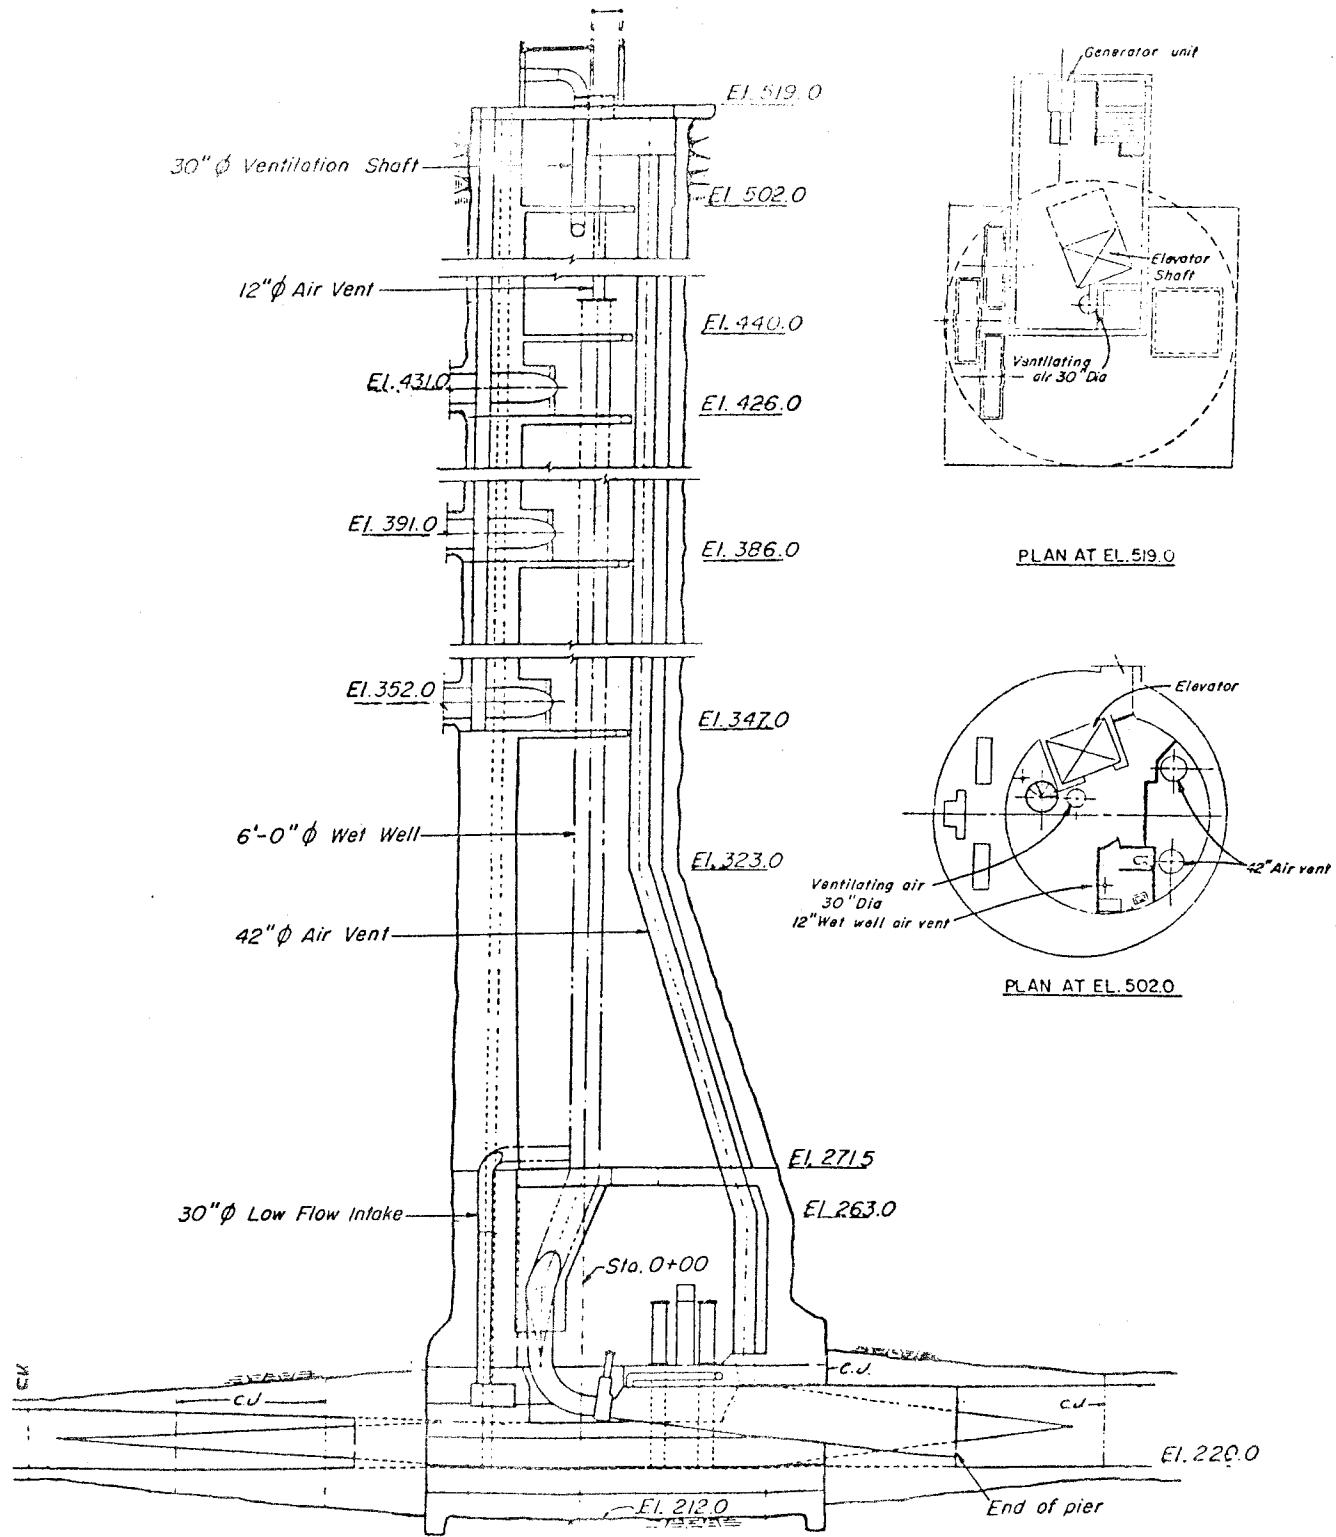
Centerline elevation view of intake control structure, Warm Springs Dam
